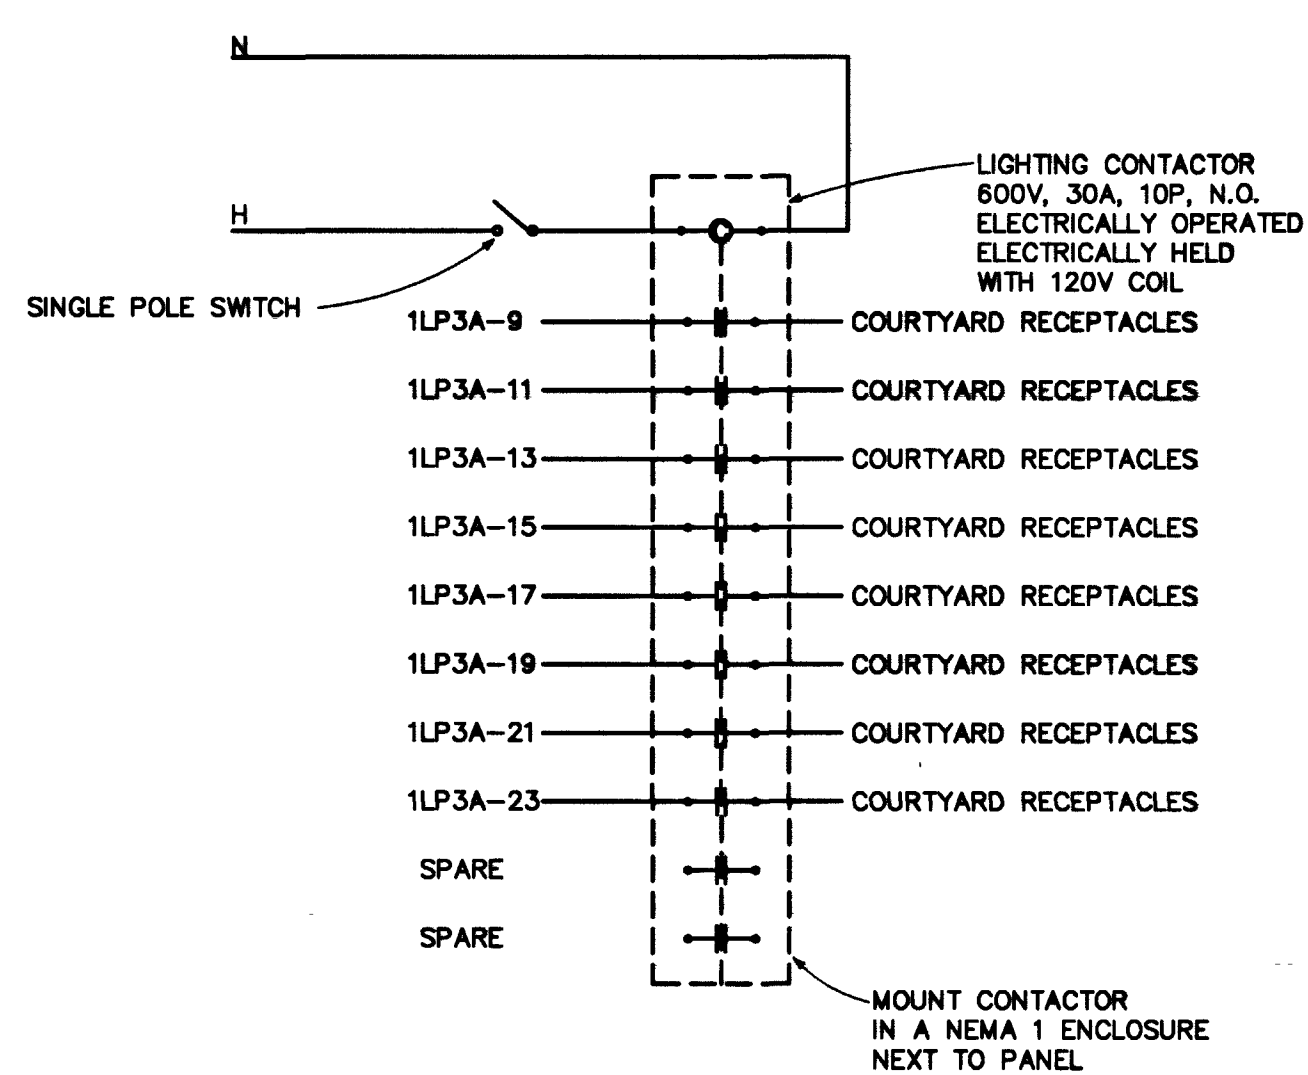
TYPICAL WIRING SCHEMATIC FOR EMERGENCY LIGHTING CONTROL
